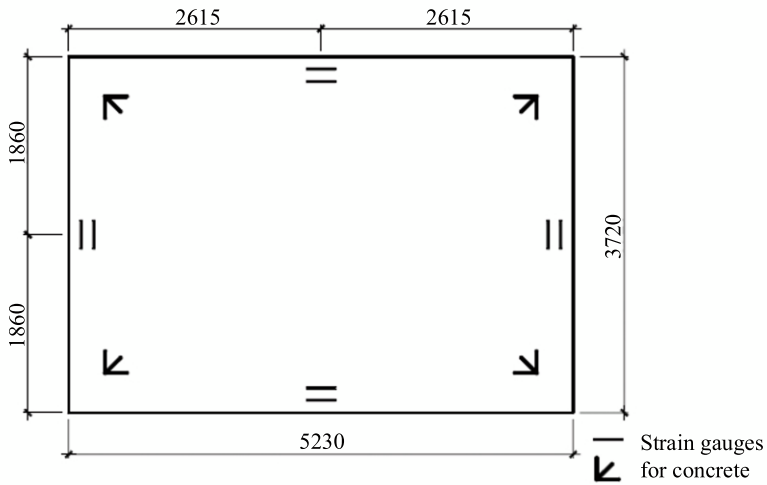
Arrangement of strain gauges for the concrete (mm)
